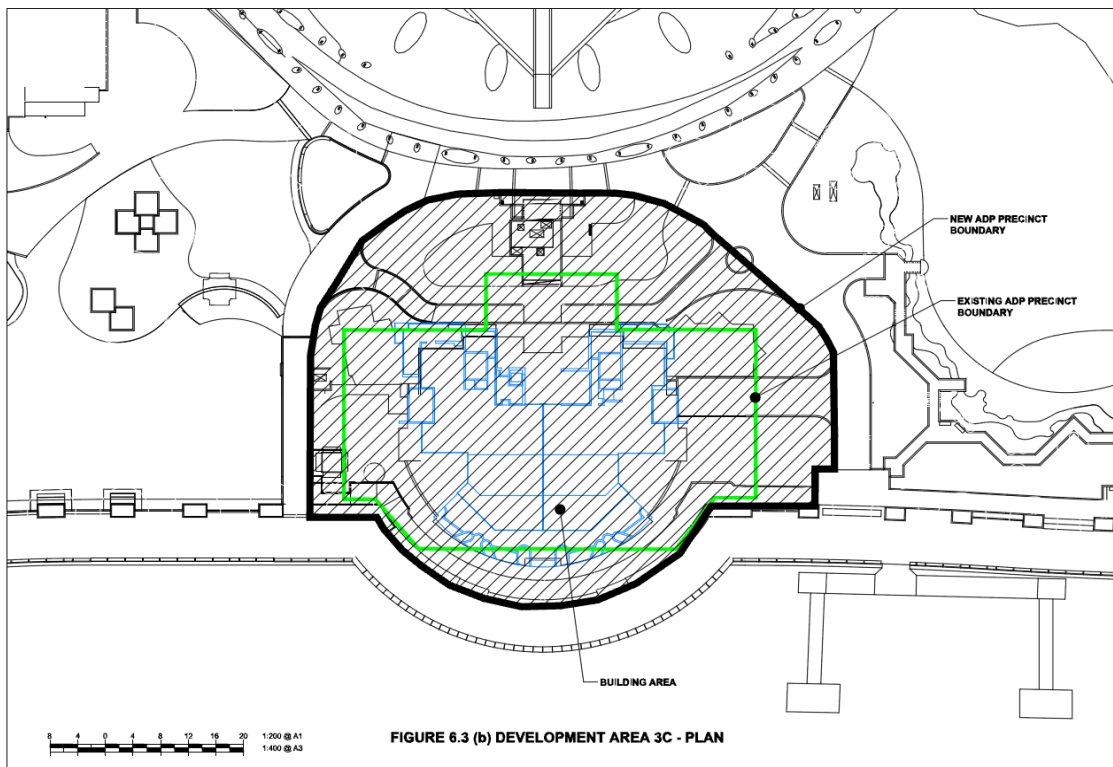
(b) DEVELOPMENT AREA 3C - PLAN
